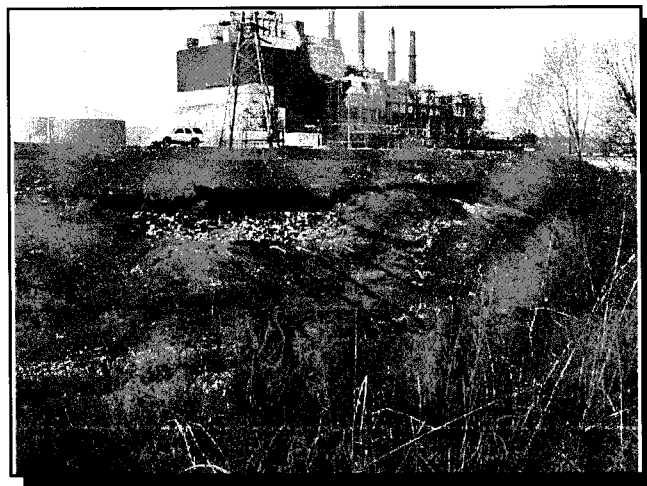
A shallow rotational failure in a containment berm at an ash settling pond in Ohio.
